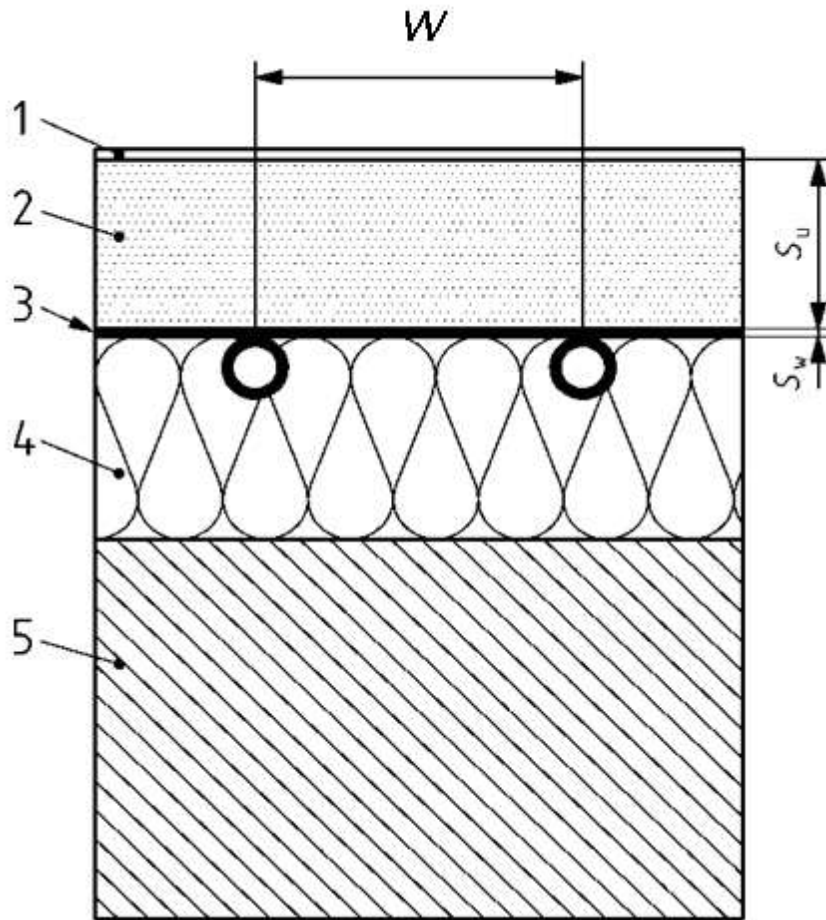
shows a variety of built-in floor, but the methods can be used for wall and ceiling systems, with the corresponding tubing.
